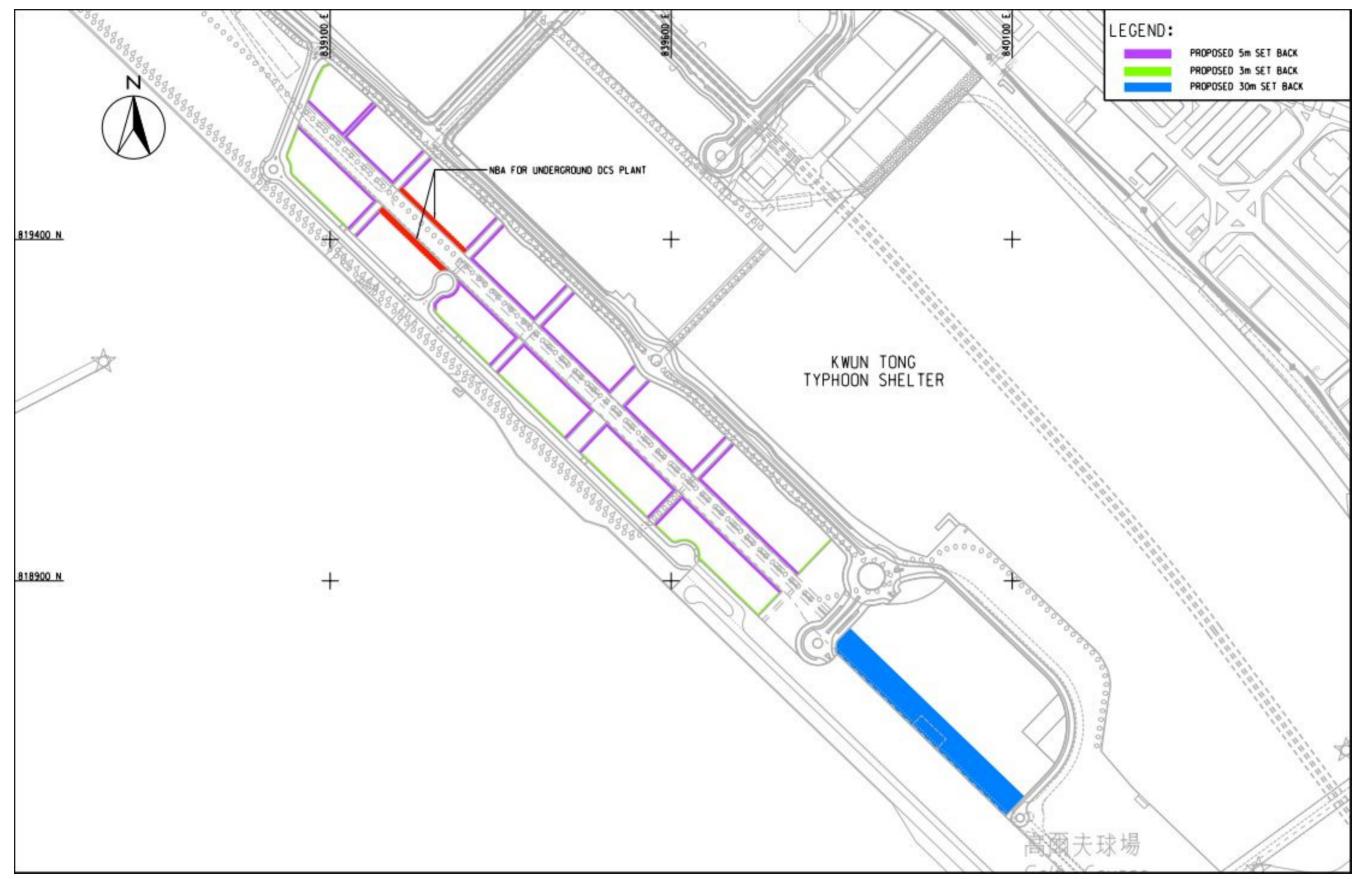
Proposed Building Setbacks in North Apron Area (Sheet 2 of 2)
